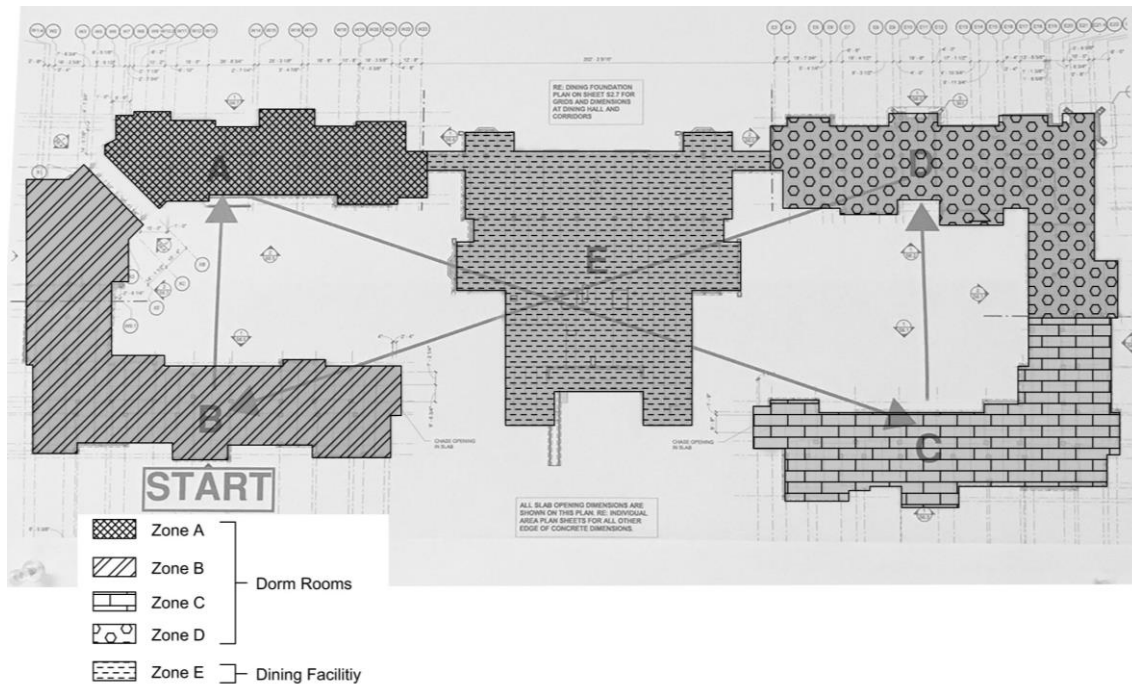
Building Footprint Indicating Zones and Planned Workflow
